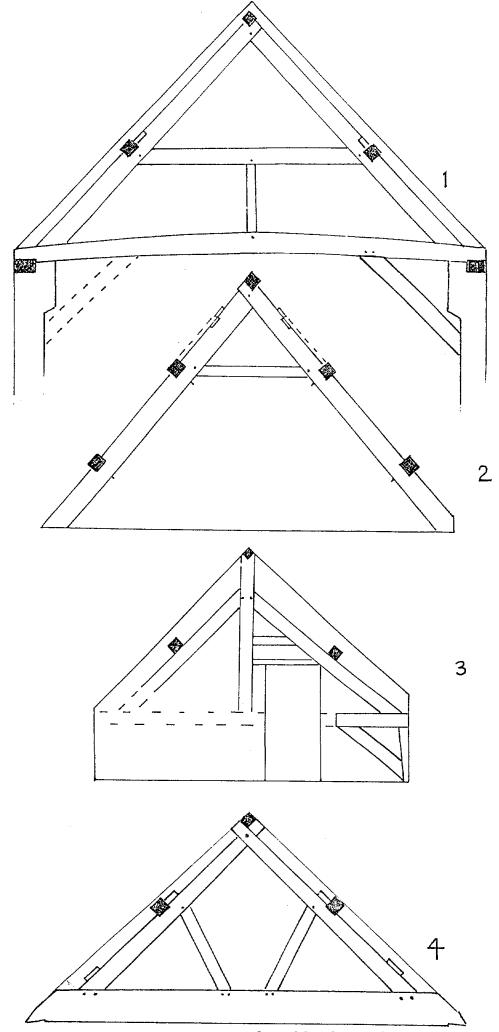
ROOF FORMS 1 tiebeam truss 2 collarbeam truss 3 kingpost truss 4 tiebeam truss with crossed apex
